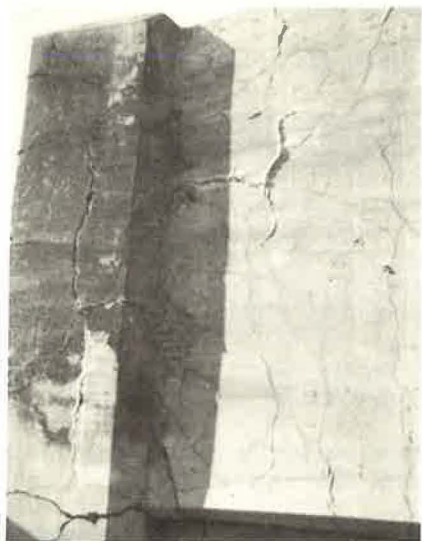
Pier and cap of Old Chicasaboque bridge near Mobile, Ala.
